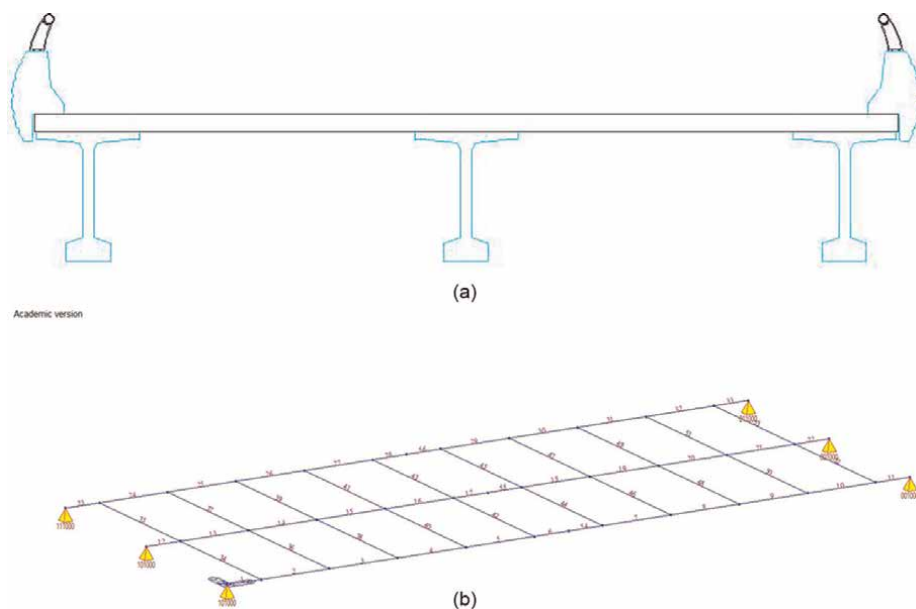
Grillage discretization: (a) girder bridge deck cross section; (b) structural grillage model.
